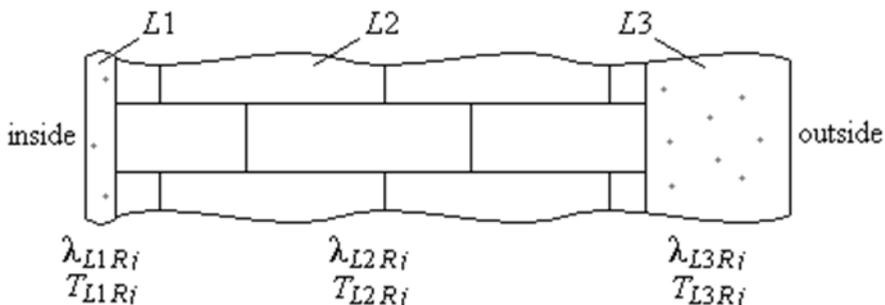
Cross-sectional view of multilayer building envelope: 1 – layer L1 (internal): cement plaster; 2 – layer L2 (main base-load structure): brick layout; 3 – layer L3 (TPE): unique material for each of rooms.
